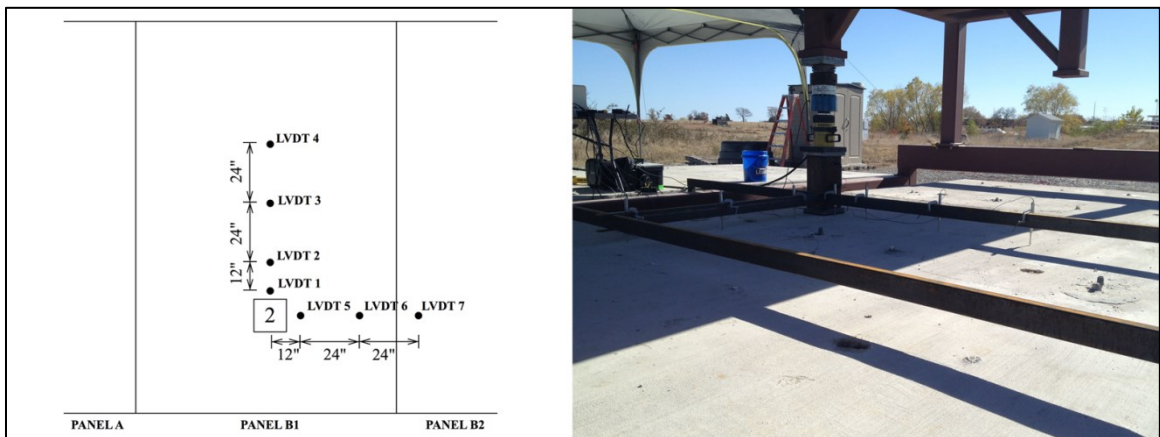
Instruments Layout at Test Location 2 at Test Pavement II. Test Location 2 is located over the wheel track of Panel B1, at a location supported by the thickened edge beam.
